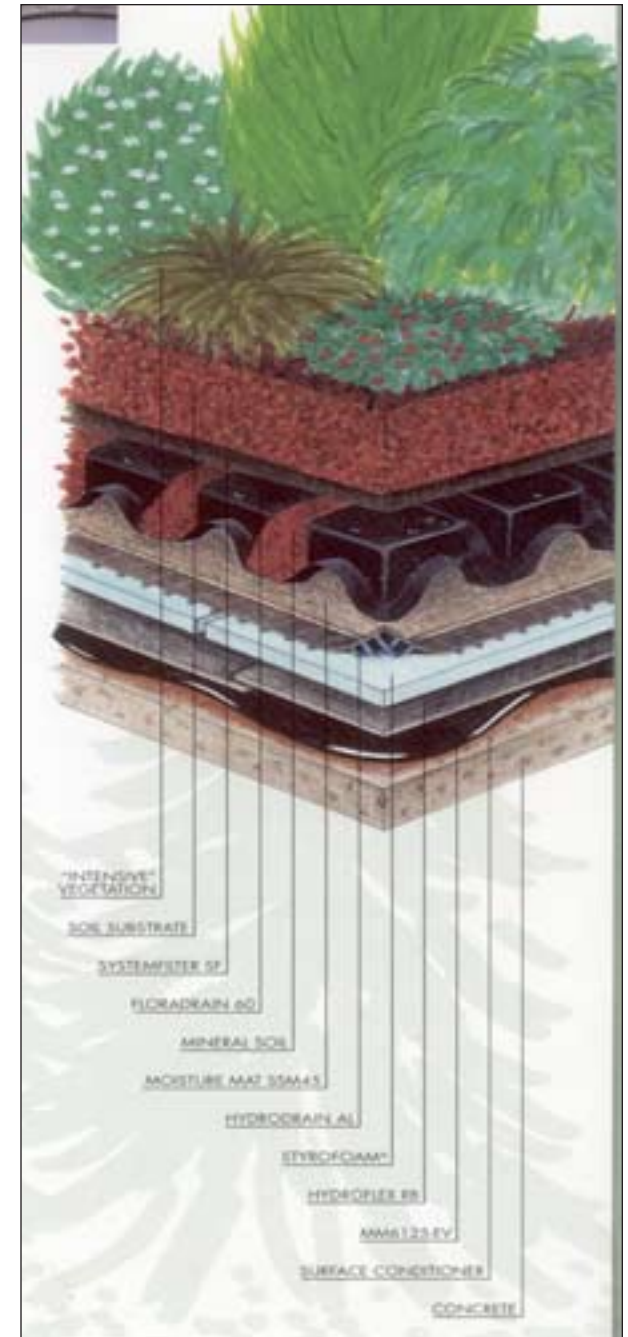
Schematic Cross Section of an Intensive Green Roof, Source: American Hydrotech Inc.
